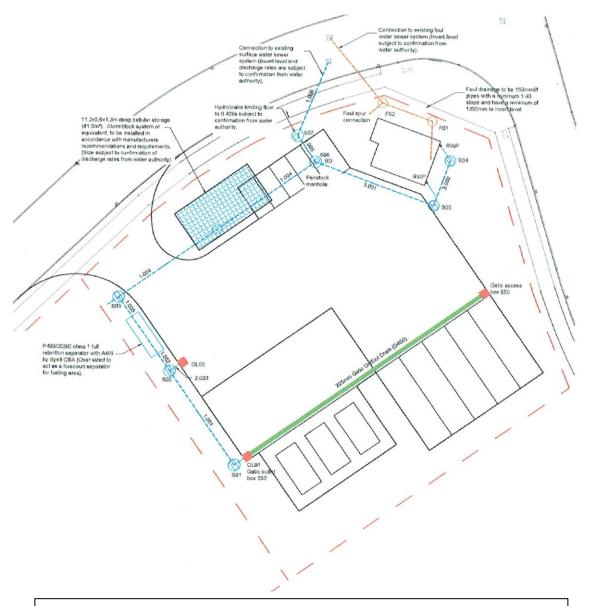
Block plan showing the proposed layout of the development site at an original scale of 1:200, (not to scale), (extract from Architects plan)
